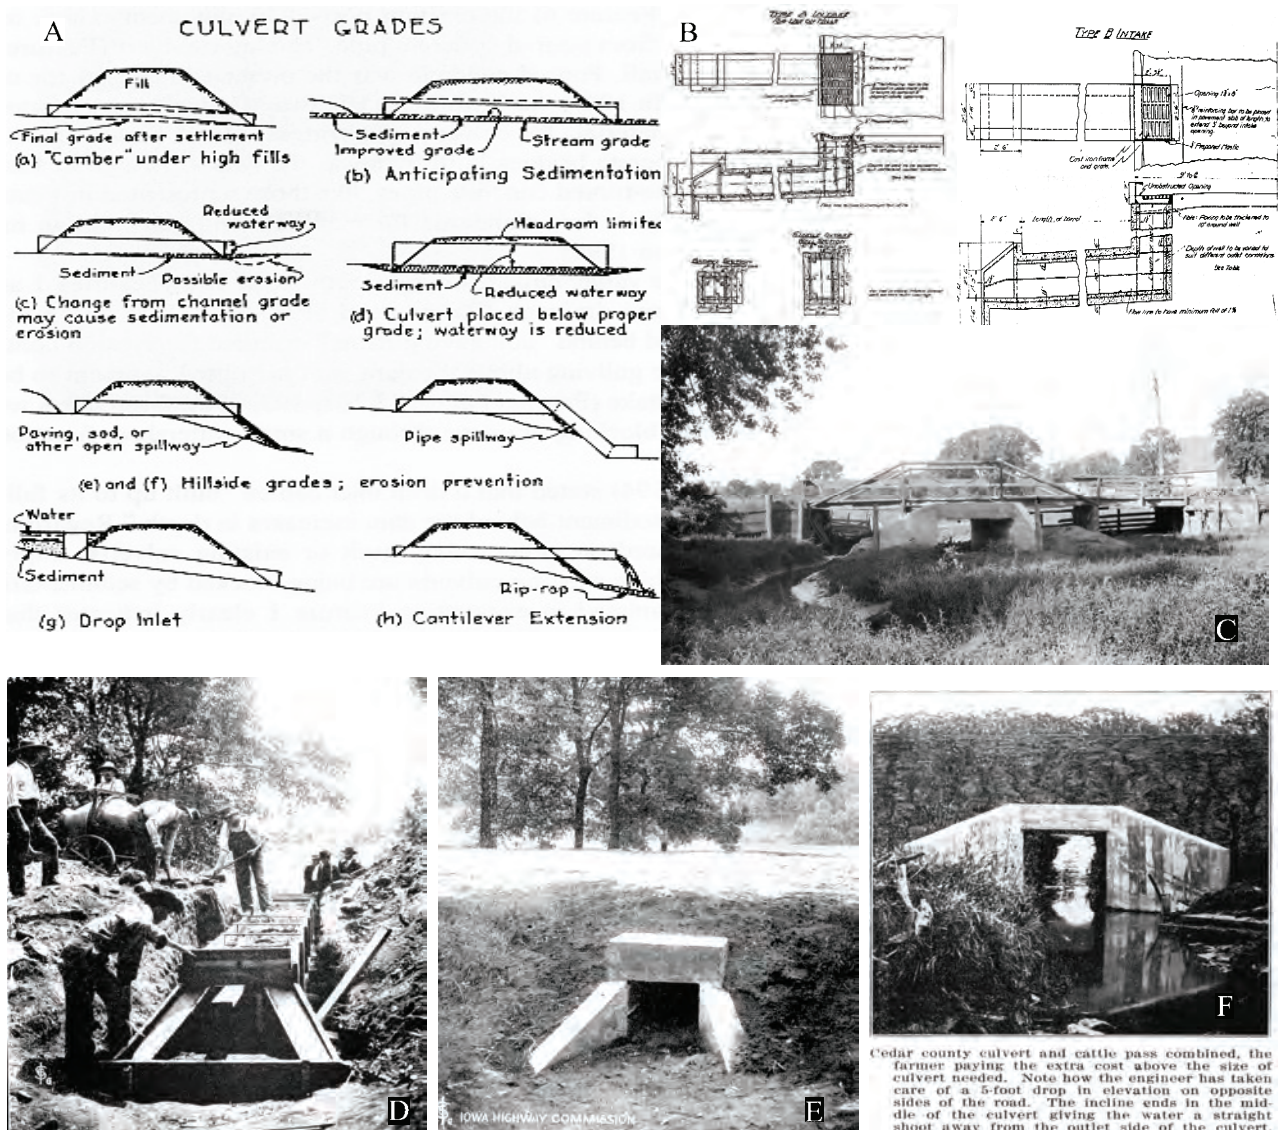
A. *Culvert Grades* (Patton 1937; Artz 1995:218). B. *Type A and Type B culvert plans from 1927 U.S 34 plans* (Iowa DOT–Map Division). Note rectangular grate cover. C. *The ca. 1928 Carson Culvert in Washington County* (IDOT Library–Culverts folder). D. *Culvert under construction* (ISHC 1906a:5). E. *Finished culvert* (ISHC 1906a:5). F. *Iowa Standard Box culvert and cattle pass combined with flaring wing walls, Cedar County* (ISHC 1915j:cover). Note caption.
